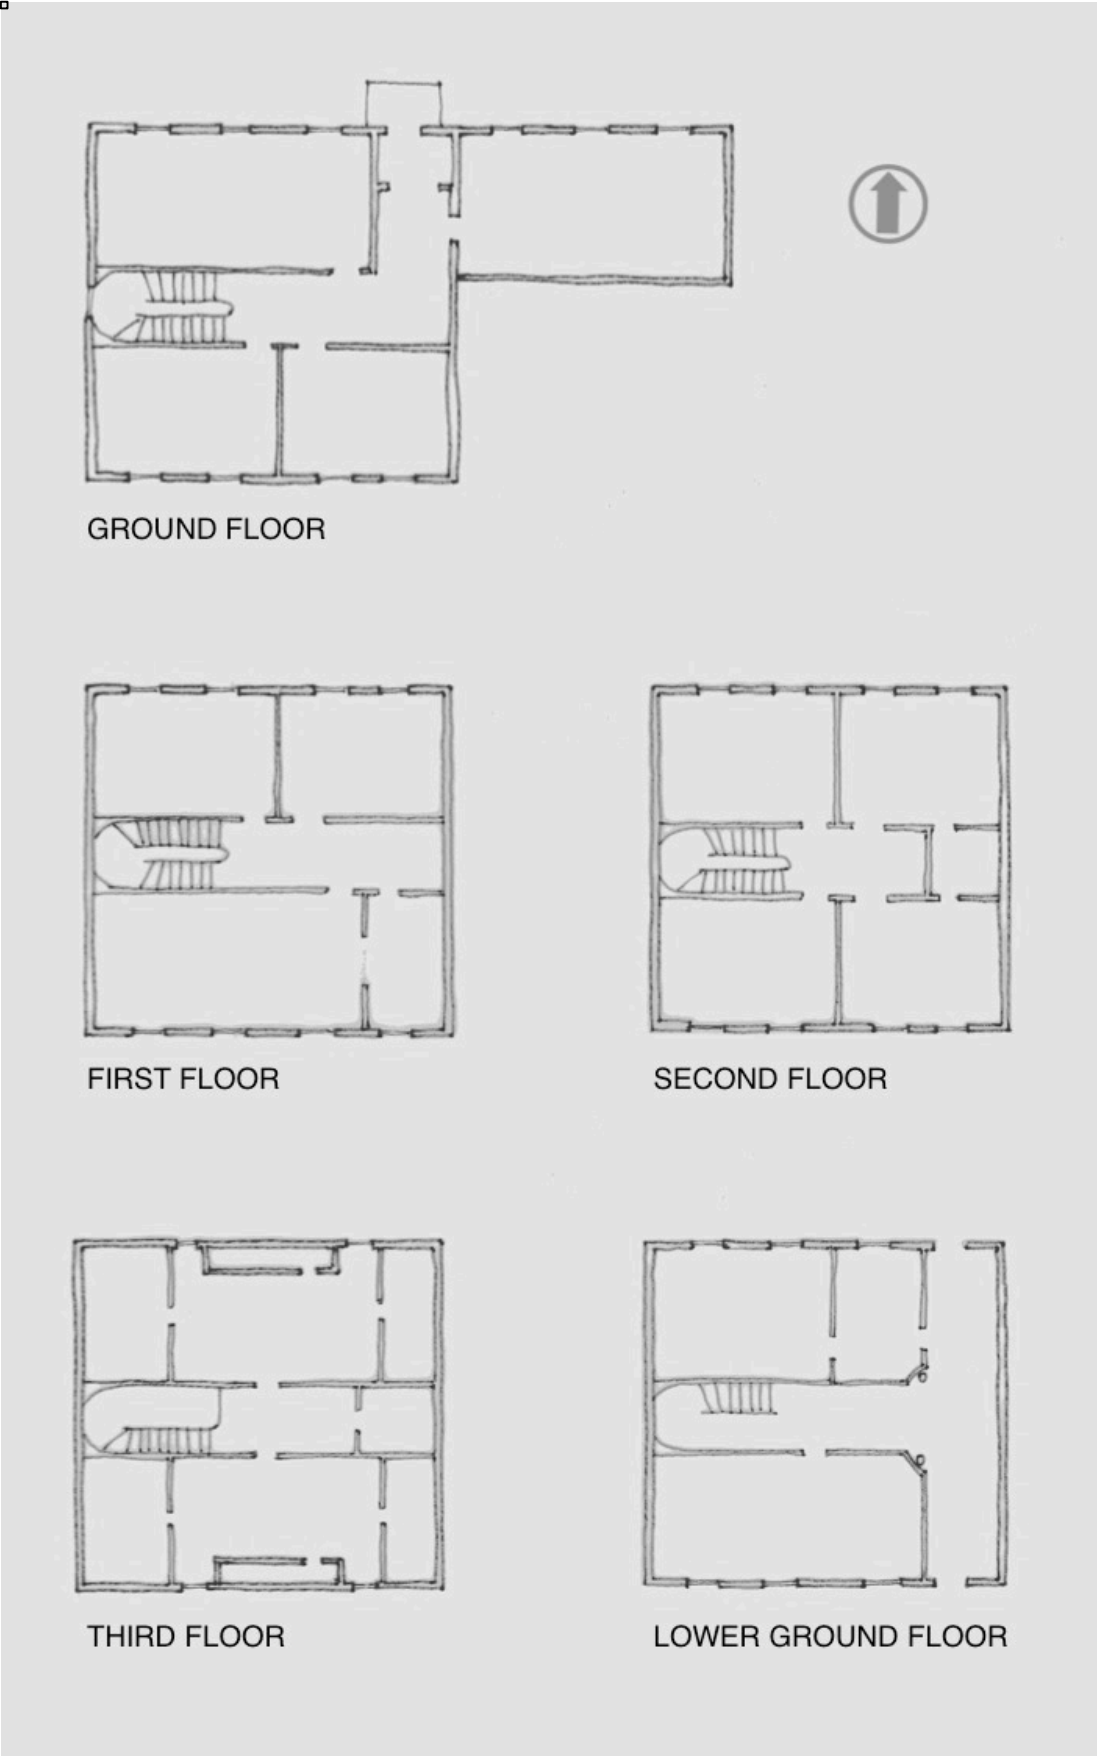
Sketch floor plan of No 9 Pier Road (not to scale)
